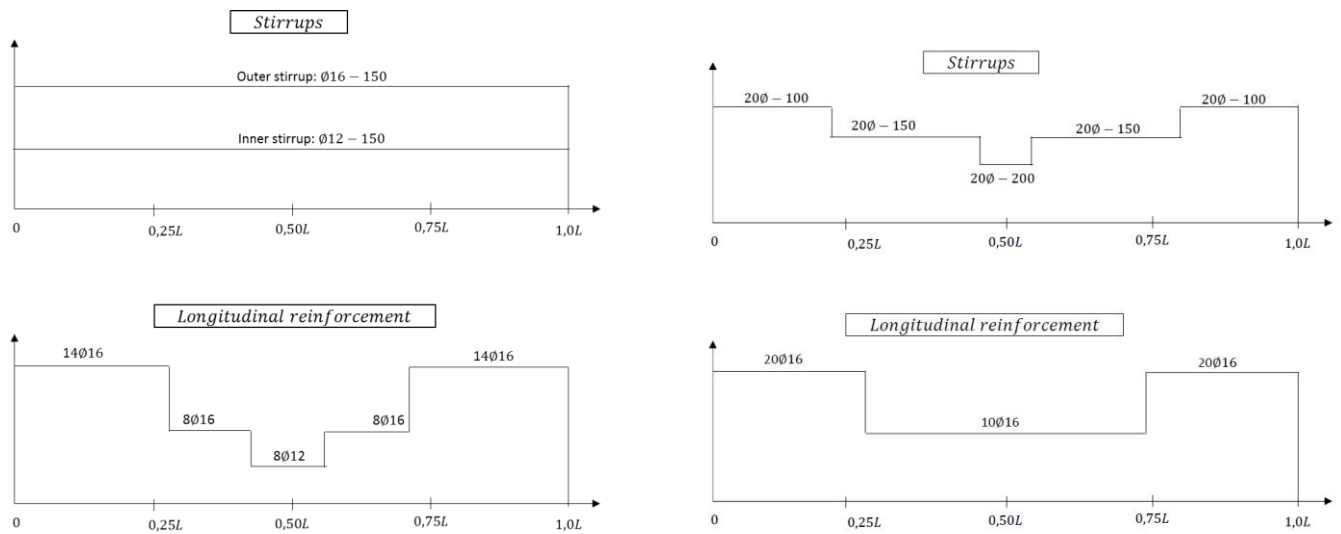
Shear and longitudinal reinforcement applied in the through girder, Bridge A (left) and Bridge B (right)
